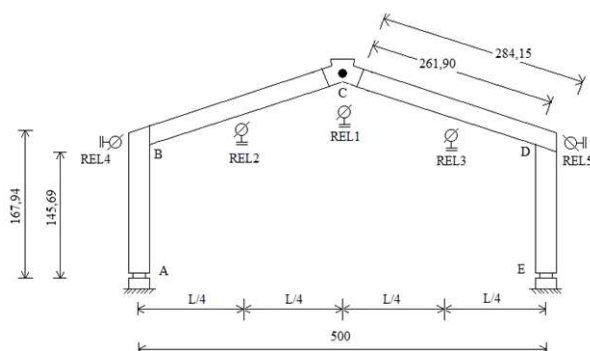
Geometric configuration of the structure and dial indicators installation position, dimensions in cm.
